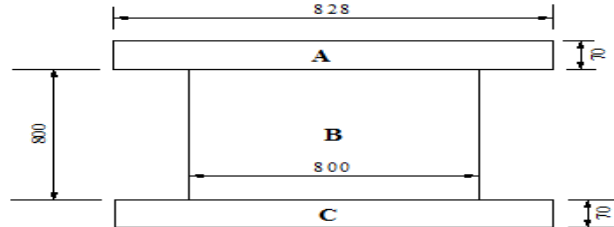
Schematic Top View of Base Plate with Dimensions (in mm)
